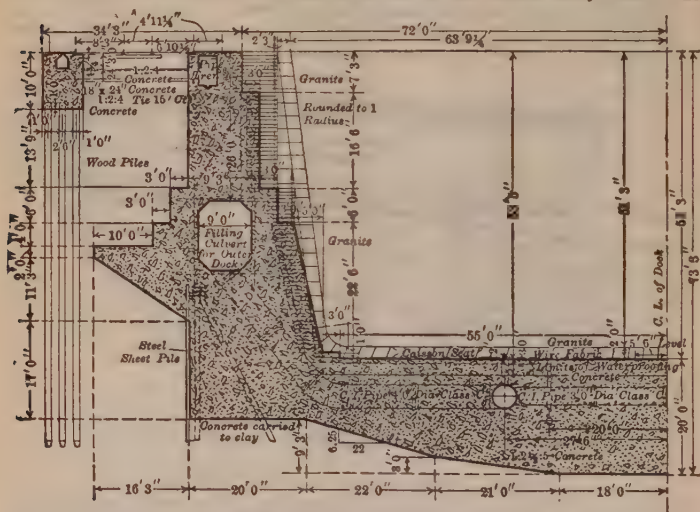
Half Section Graving Dock, Philadelphia, Pa.
